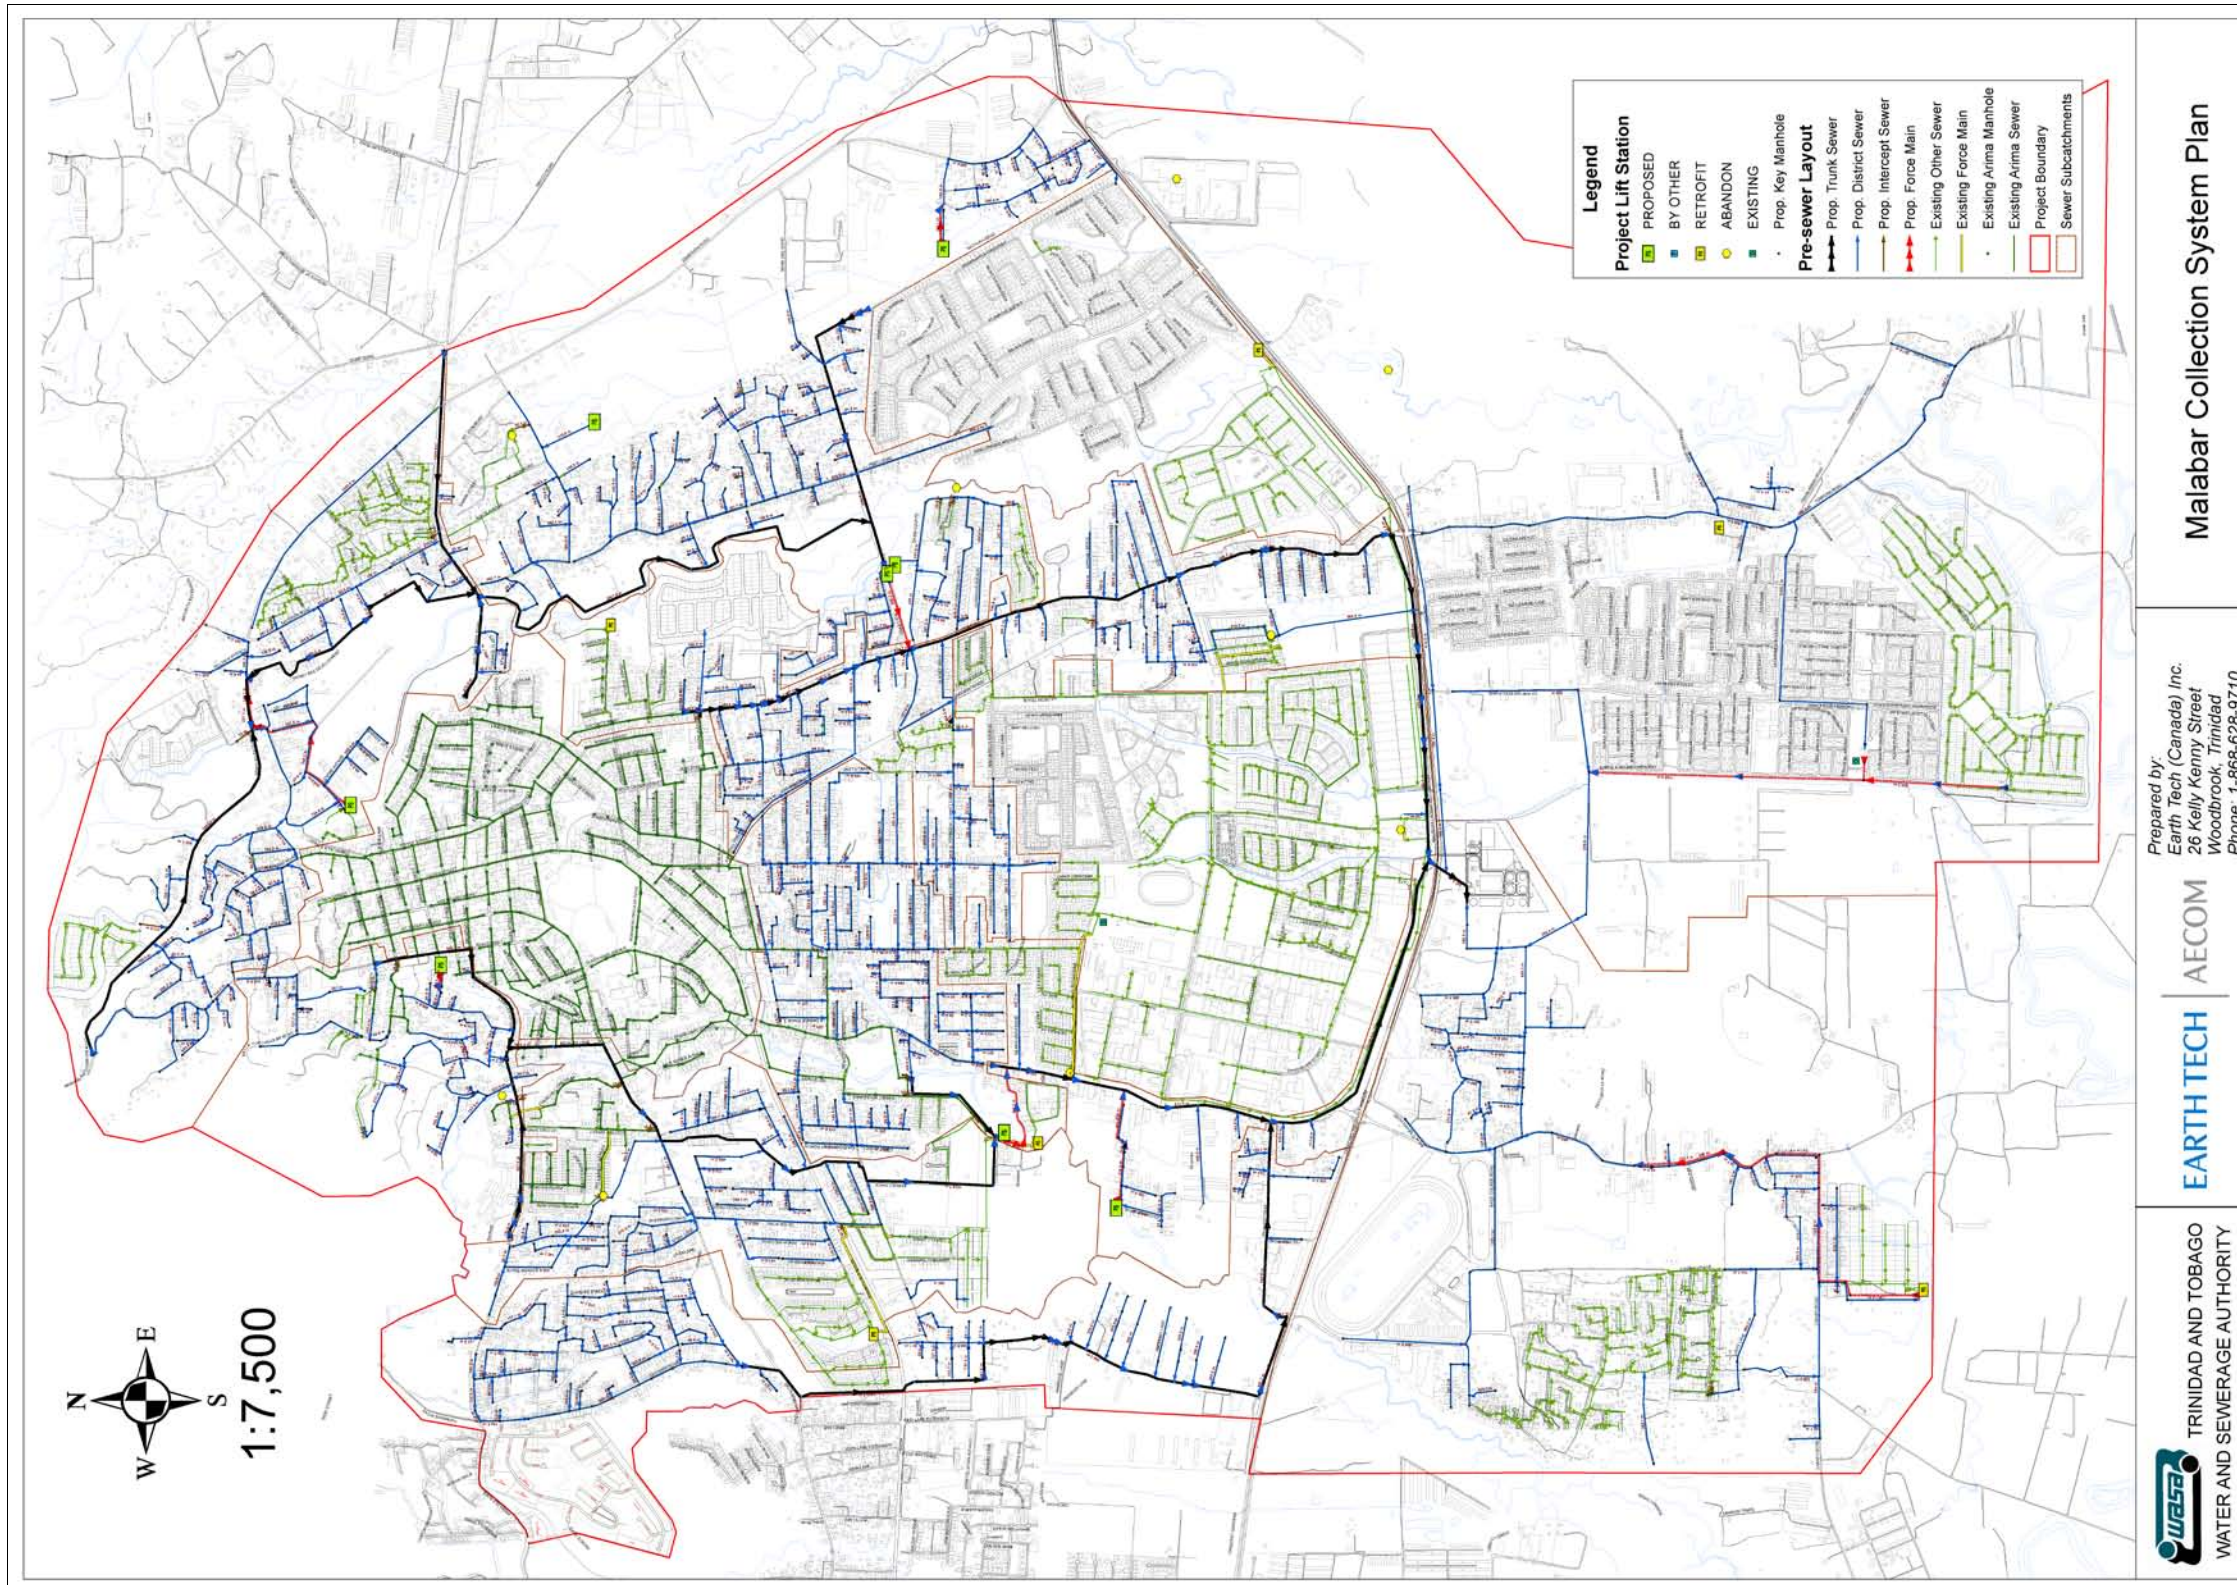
Malabar Proposed Sanitary Collection System Plan
